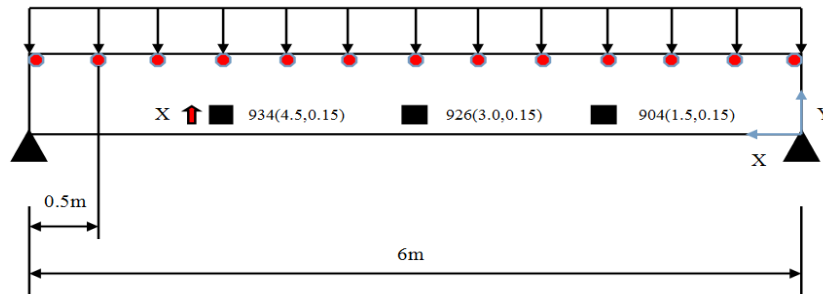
The arrangement of acceleration sensors and hammering locations of the heavy hammer
